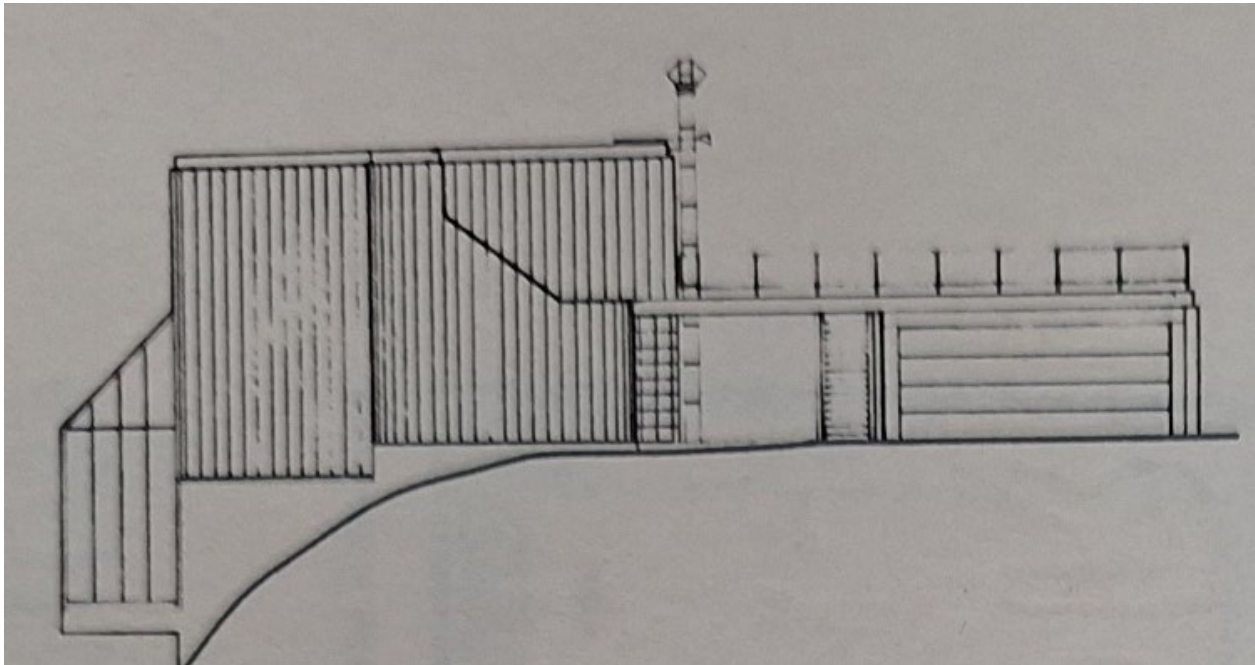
Drawing of east elevation of 2 Hedgewood Road showing the two-storey bay overlooking the West Don River Valley (Hamilton, Ridgeley, Bennett Architects, 1974).
